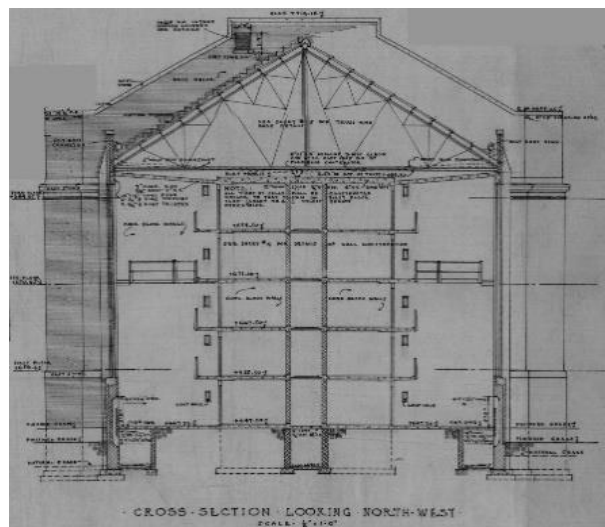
Circa 1930 Section through Quarter Houses from Drawing 6
